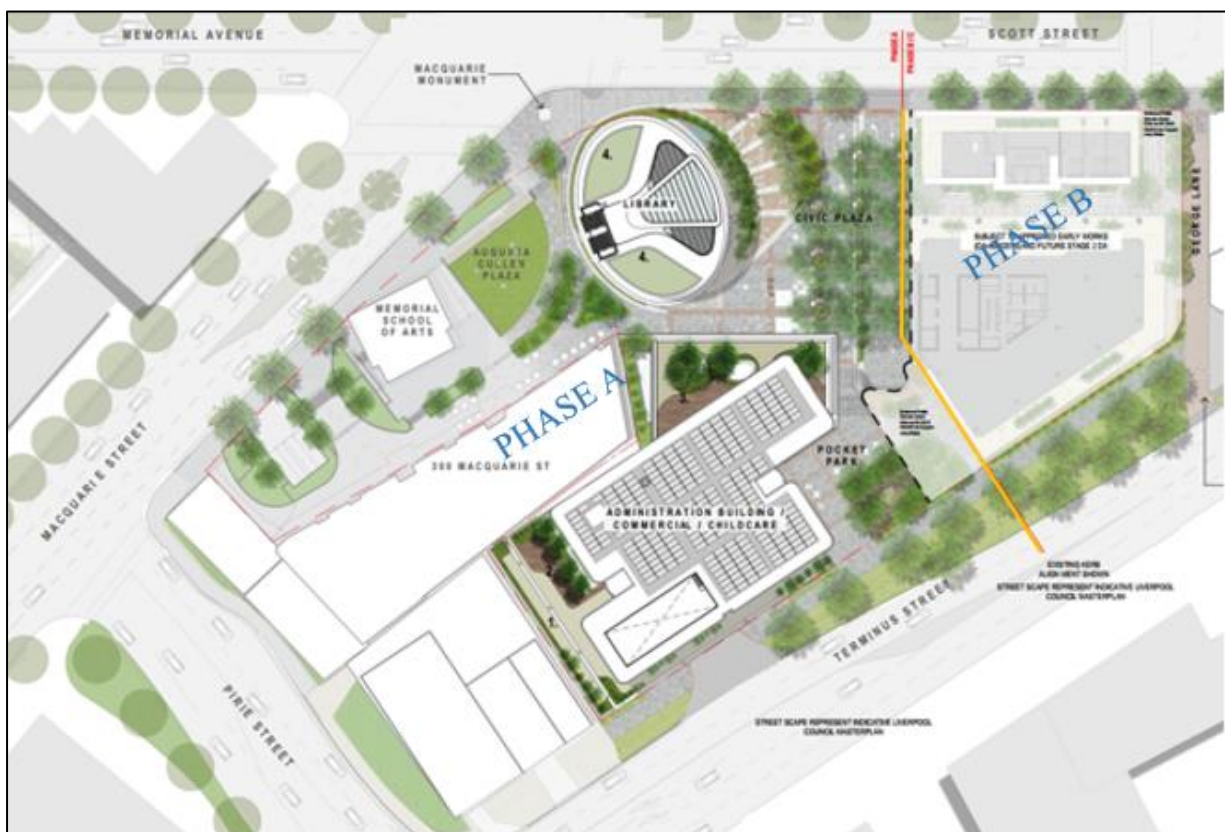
Approved layout under DA-836/2020 (Source: FJMT)
